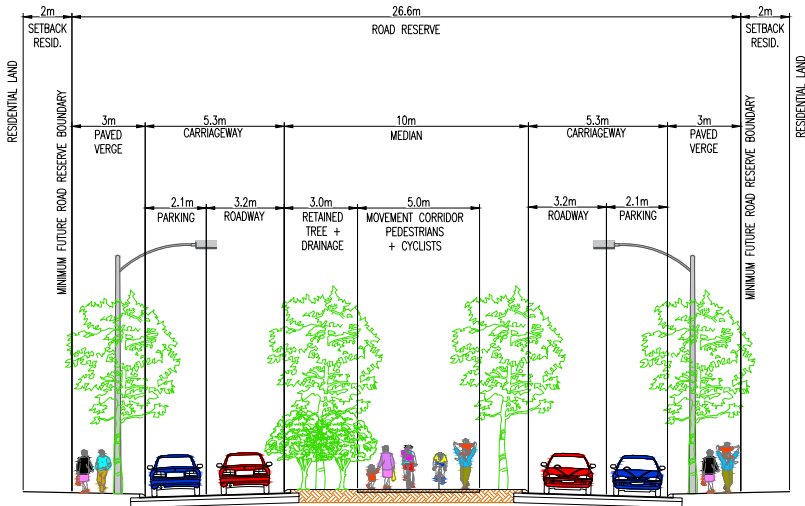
CROSS SECTION OF LANDSCAPE BOULEVARDS
